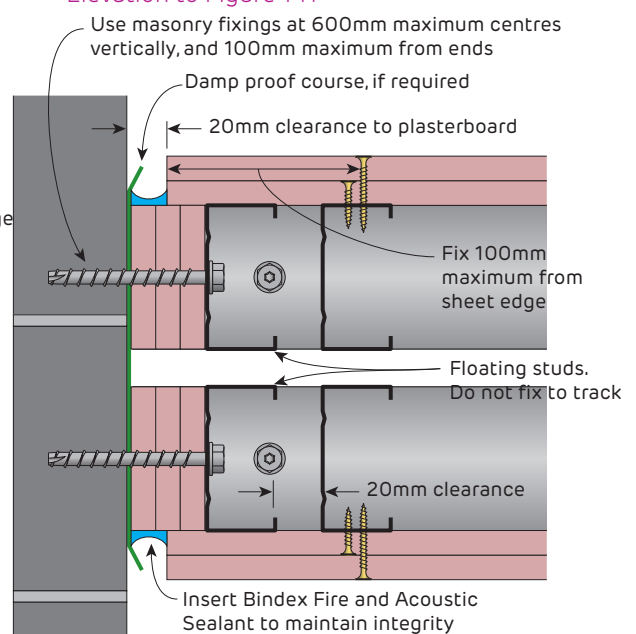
Sliding Wall End To Masonry Elevation to Figure 143
